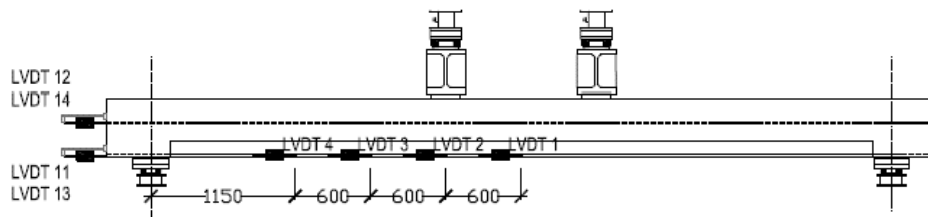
LB1 - North side view. Position of LVDT 1-4 and LVDT 11-14.
